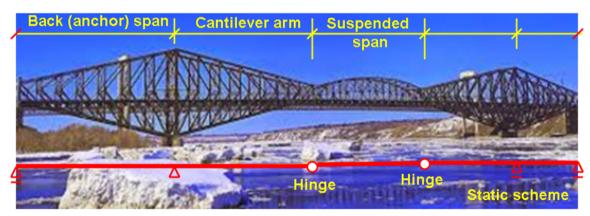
Cantilever bridge is called also Gerber bridge. Gerber girder (beam) is the girder (beam) with inserted hinges.
